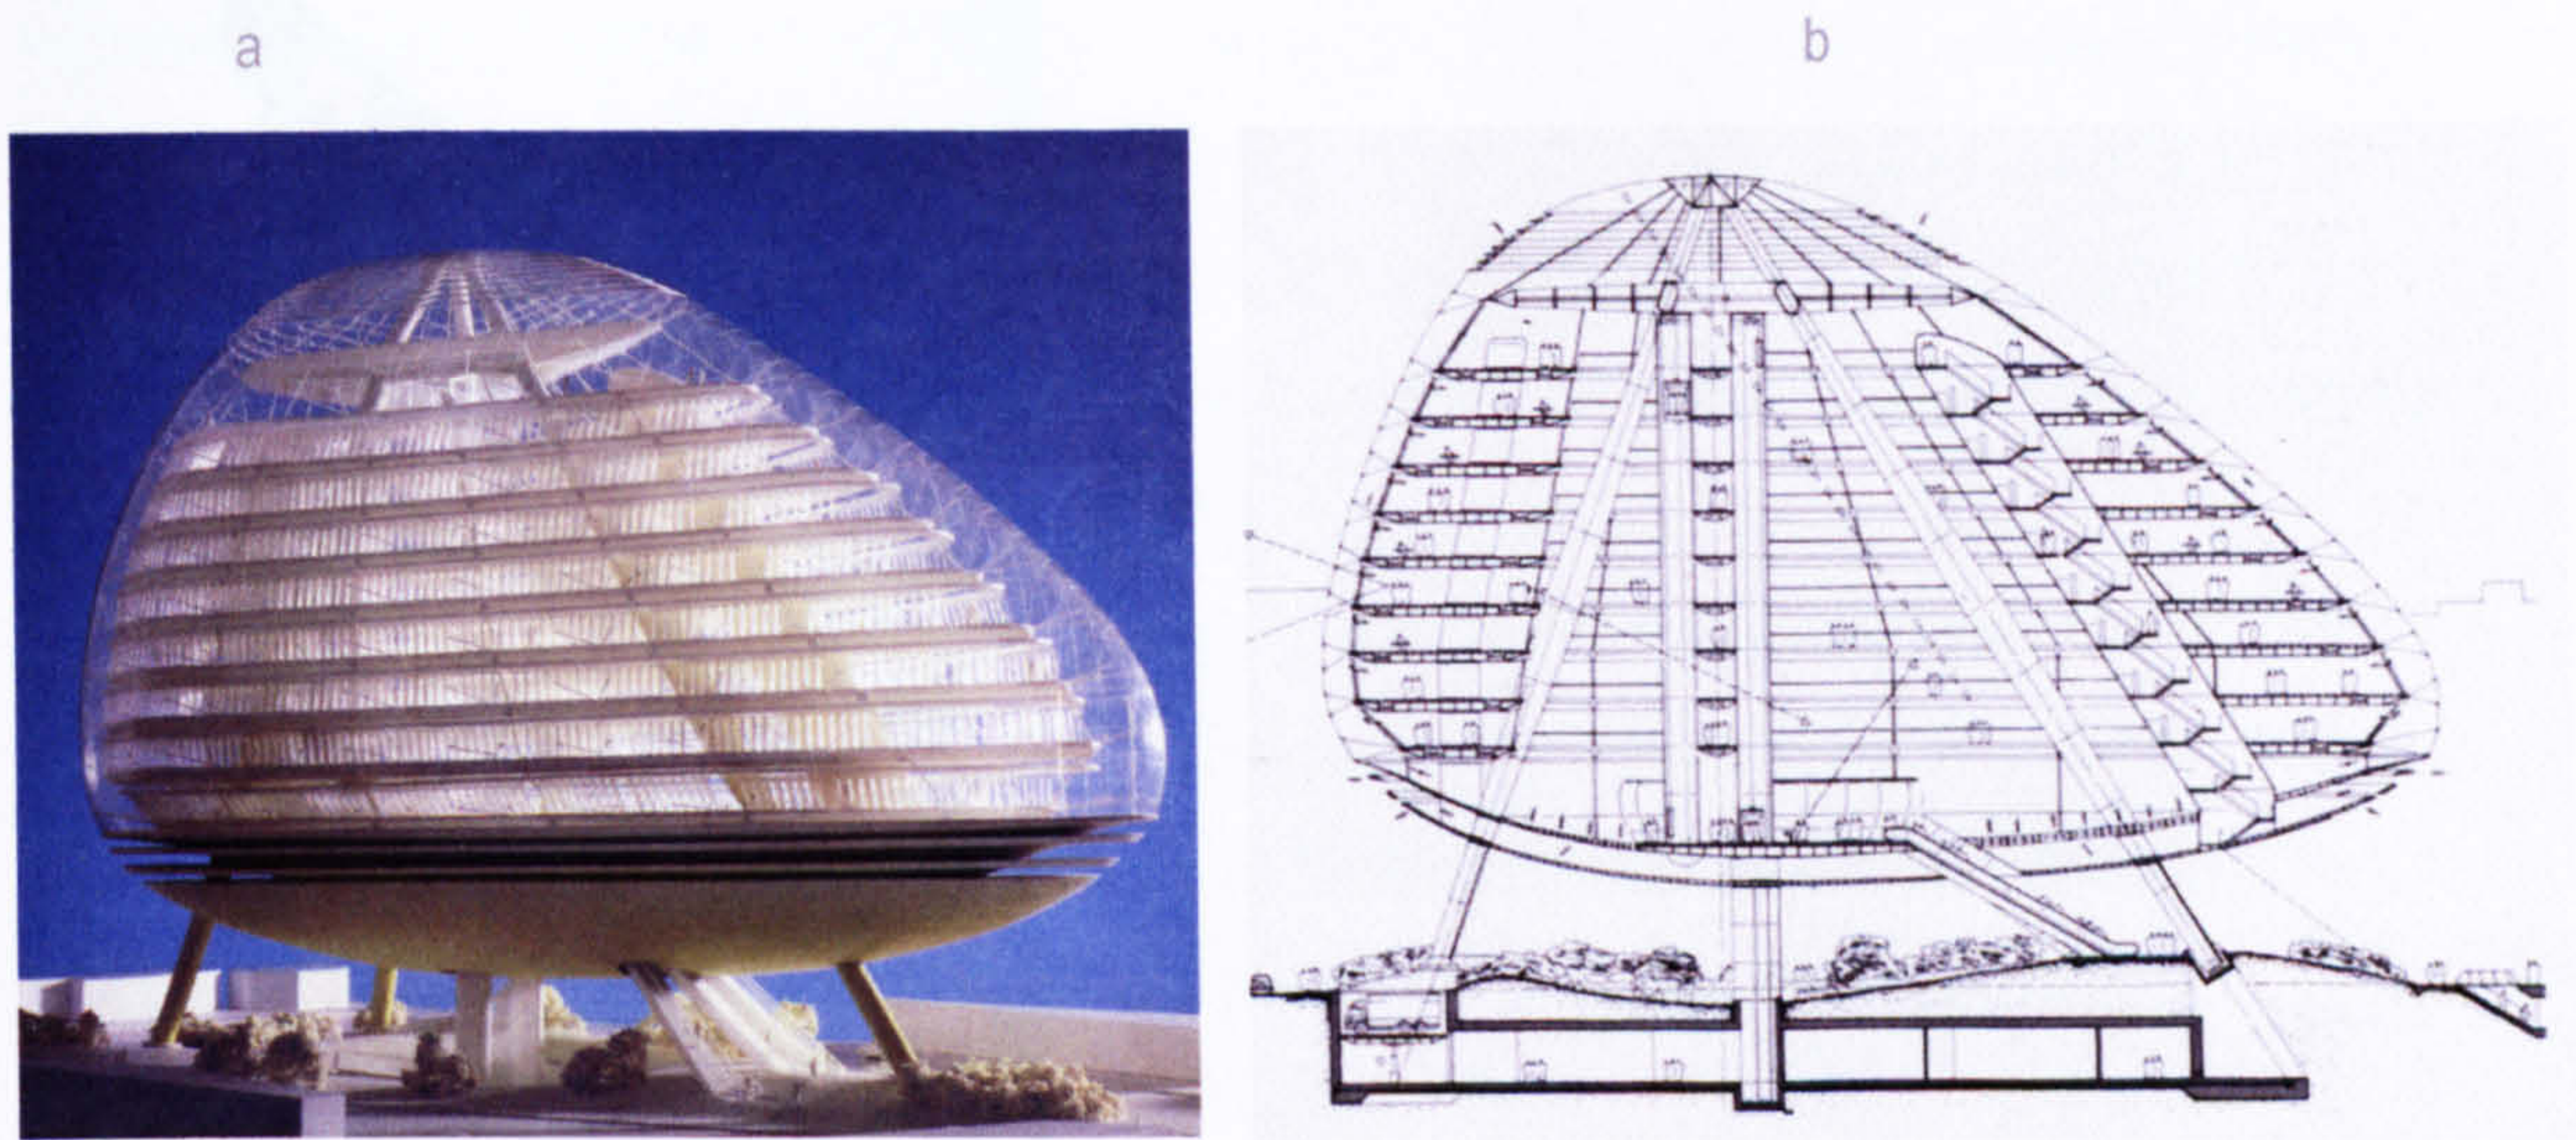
[a-b] Future Systems, building with a double skin facade, 1990. Building model and section
